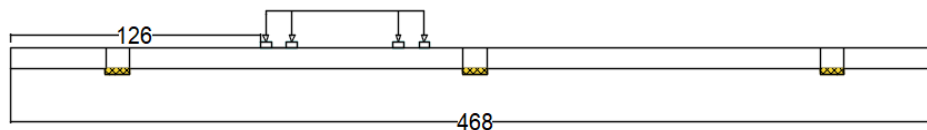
Location of P-15 truck for 15 ft girder spacing deck slab (2 cells, Case 1, unit: in)
